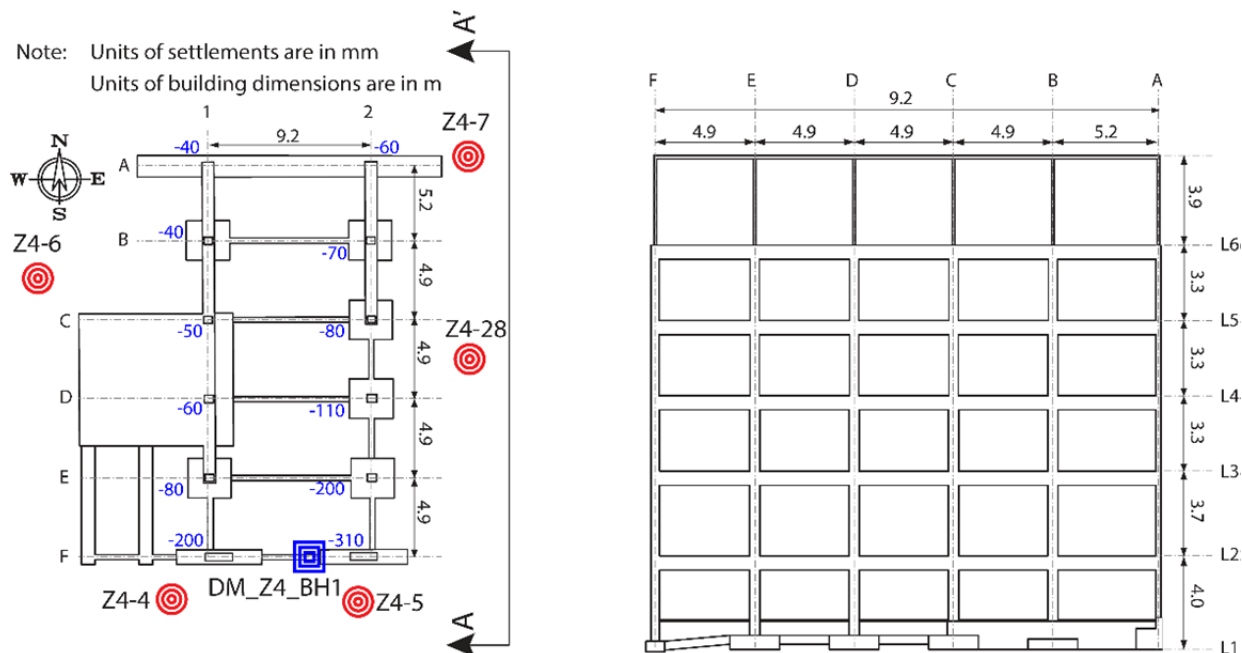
Foundation plan view of the CTUC building and elevation view of its eastern NS-oriented frame.
